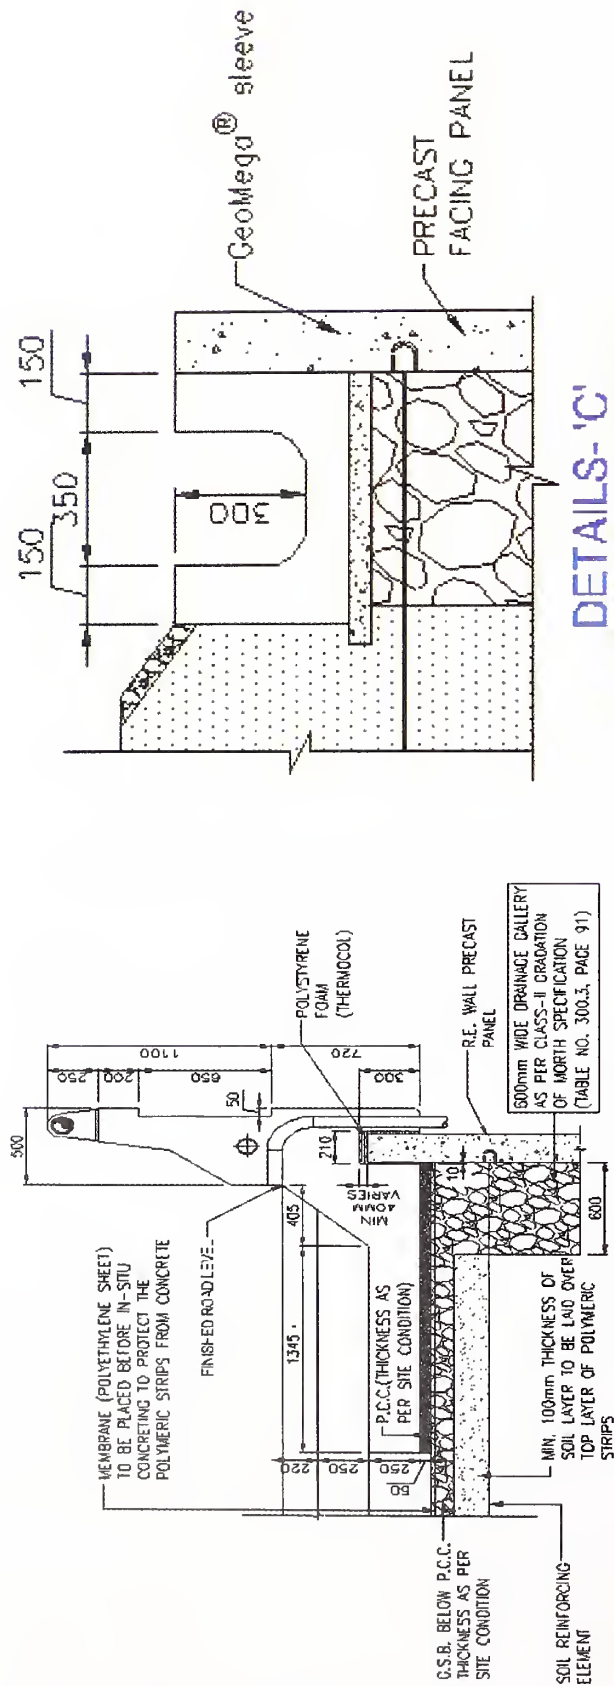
(a) Drainage Arrangement at the Top of Wall-Typical Detail for a Full Height Wall
